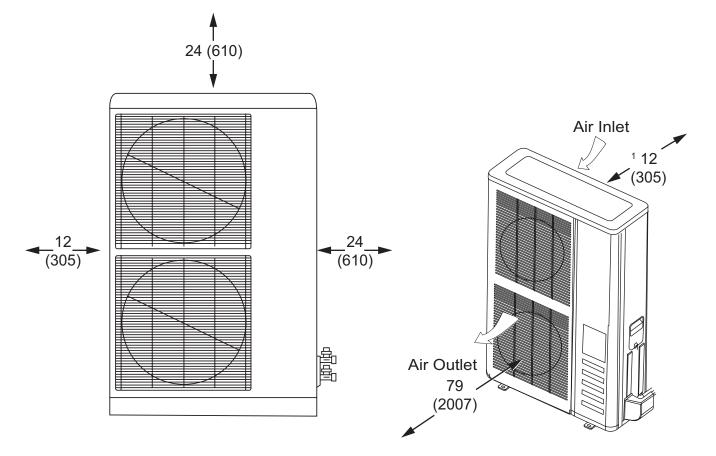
Multi-Zone Outdoor Unit Dimensions - Inches (mm)
